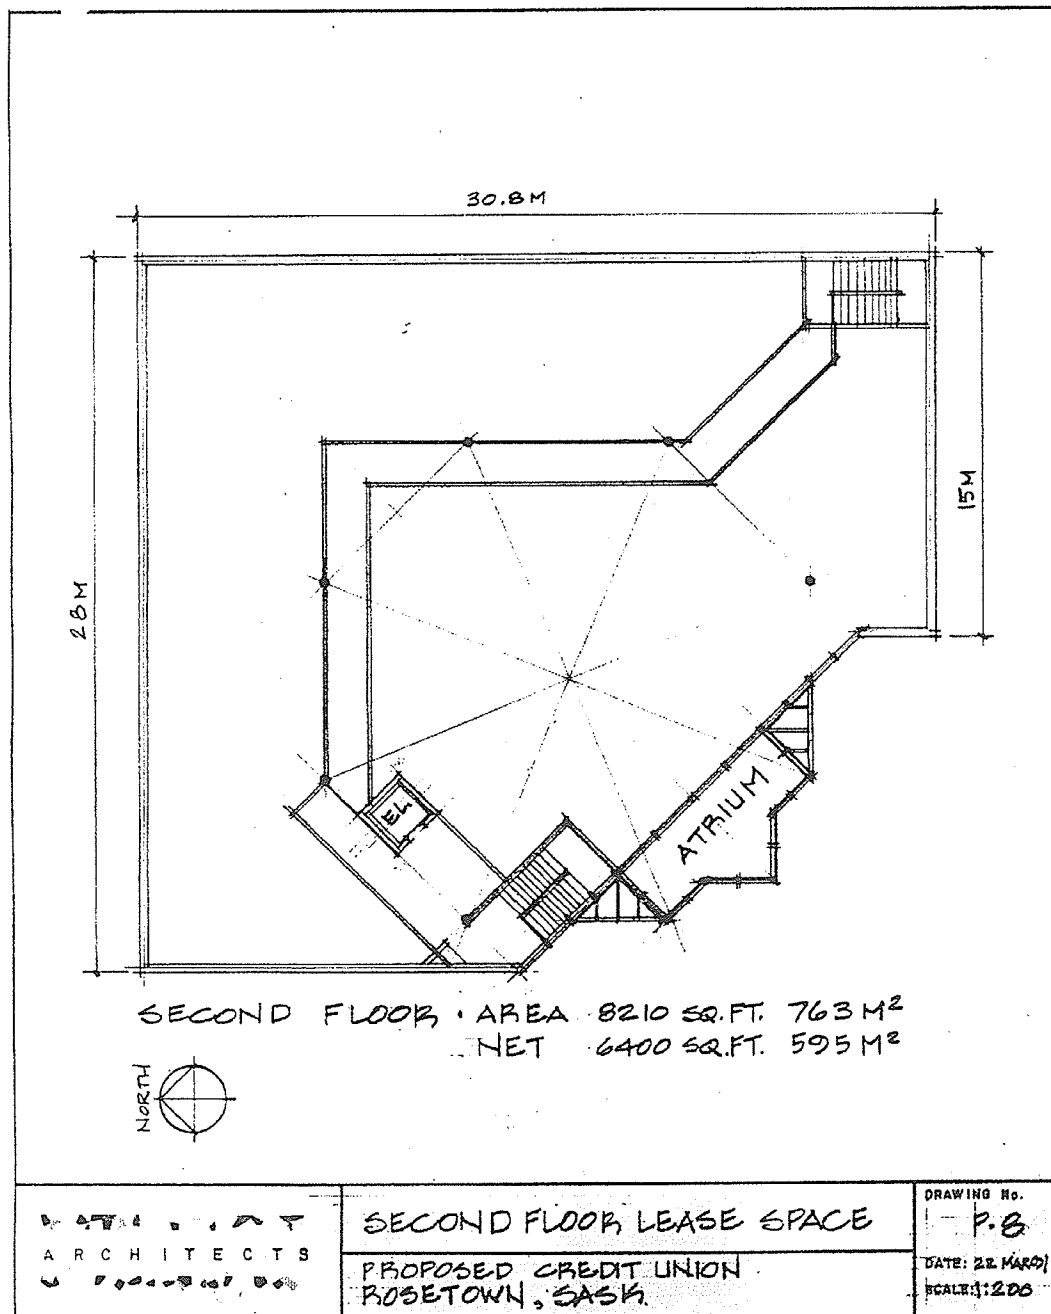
Architect design sketch 8, Second Floor Lease Space. Courtesy of the architect.
